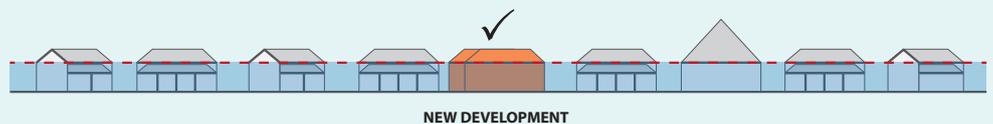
Consistent wall heights and prominent new development. Within streetscape settings of high consistency, new development should establish a strong visual relationship with the prevailing wall height, as established by eaves, gables or parapets, as may be applicable.
